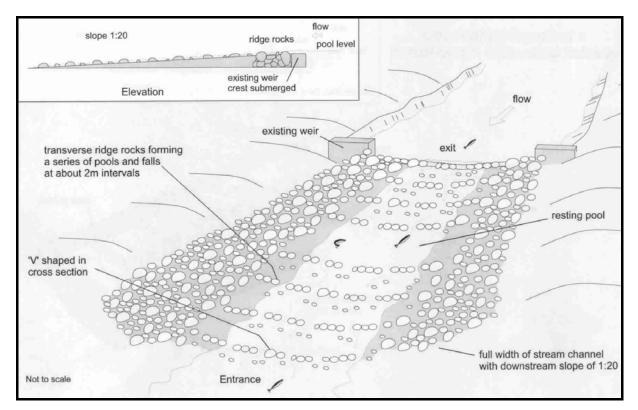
Conceptual drawing of a full-width rock-ramp fishway (plan view)
